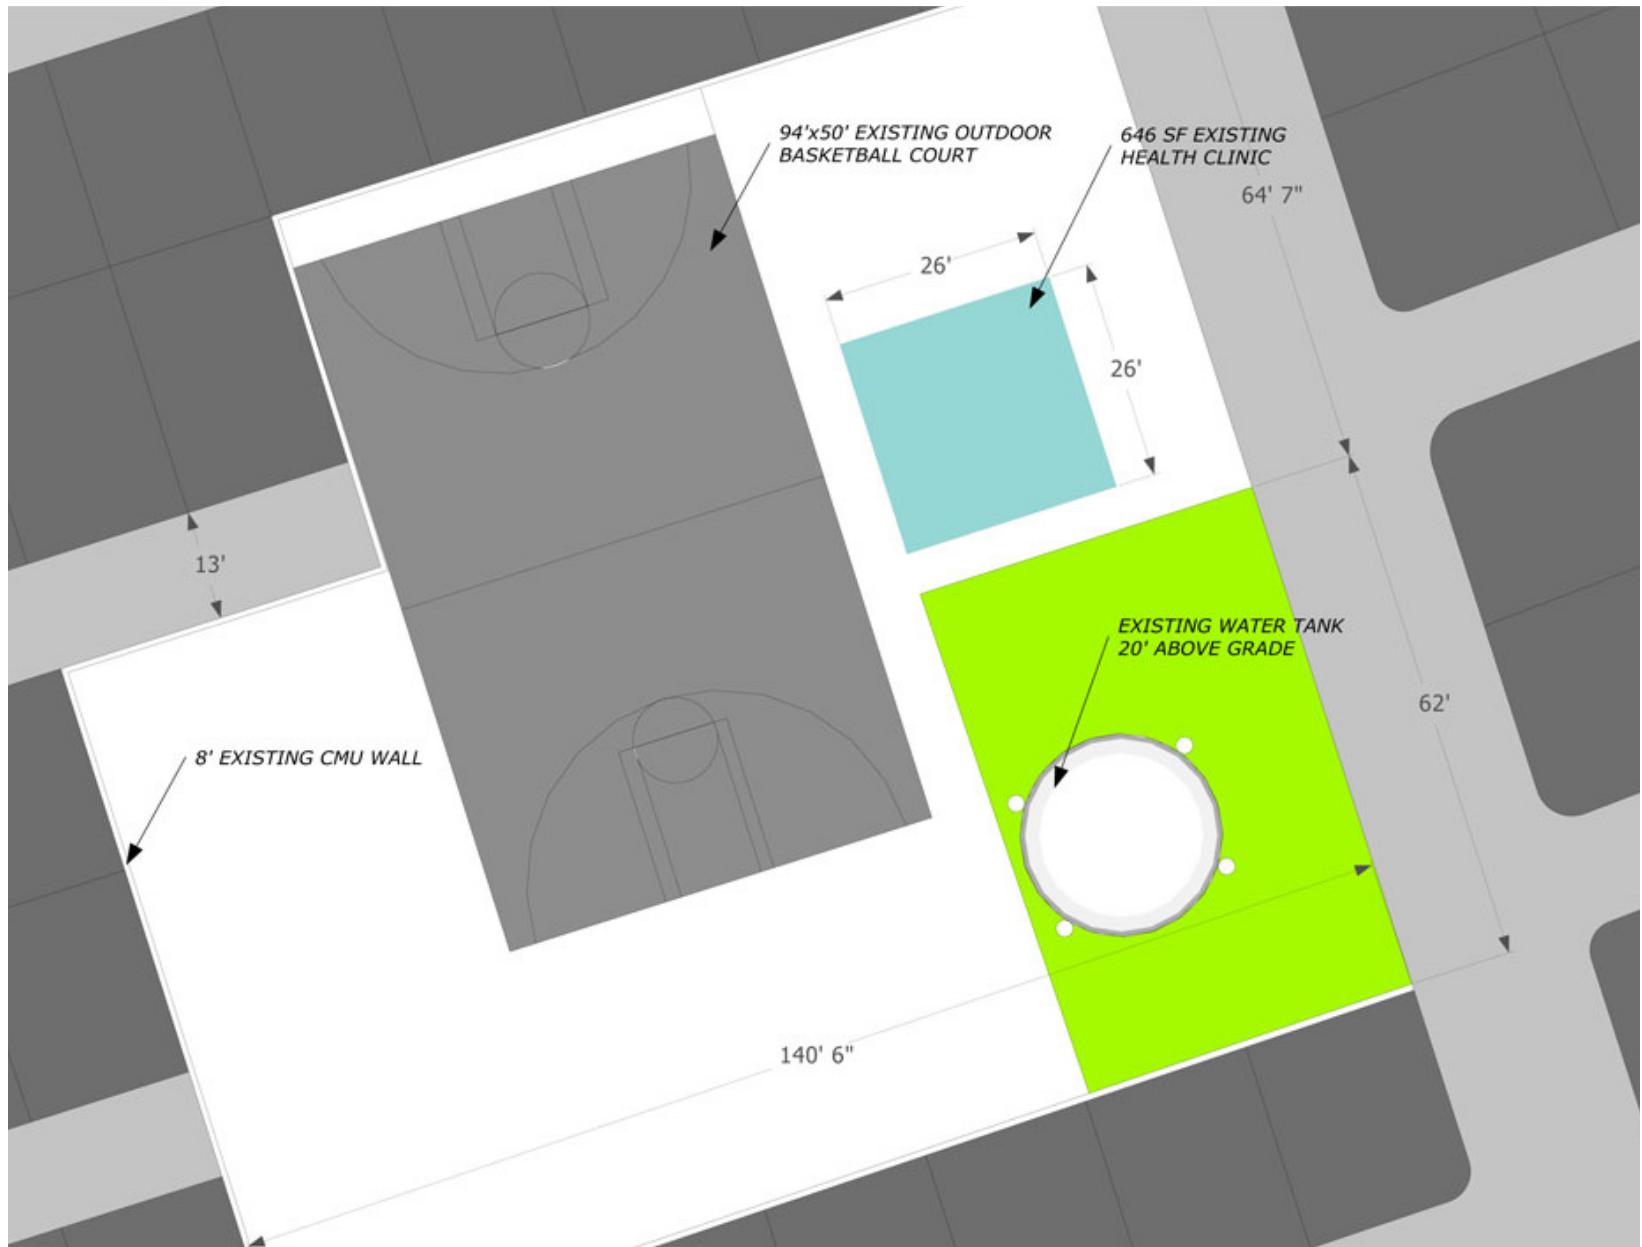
Enlarged Existing Site Plan, Scale: 1/16" = 1'-0"
